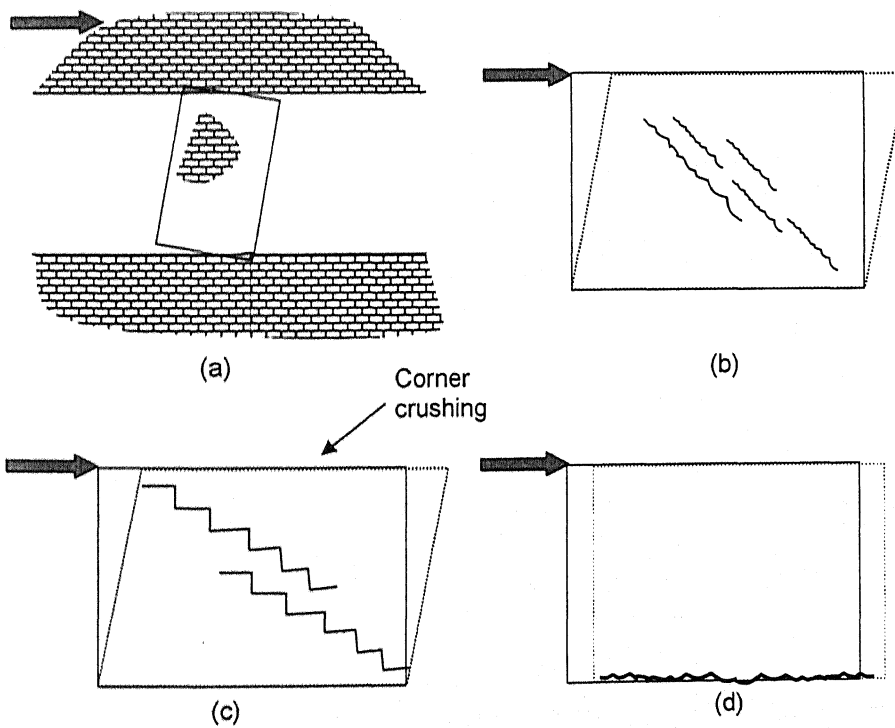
Failure mechanisms of masonry subjected to seismic actions: (a) Rocking failure, (b) Shear cracking through the bricks, (c) Shear cracking through bed and head joints, and (d) Sliding failure.
